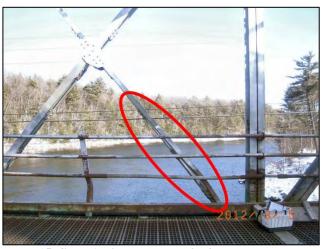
Span 1 Right Truss - L3U4: Impact damage <12-0047a>
